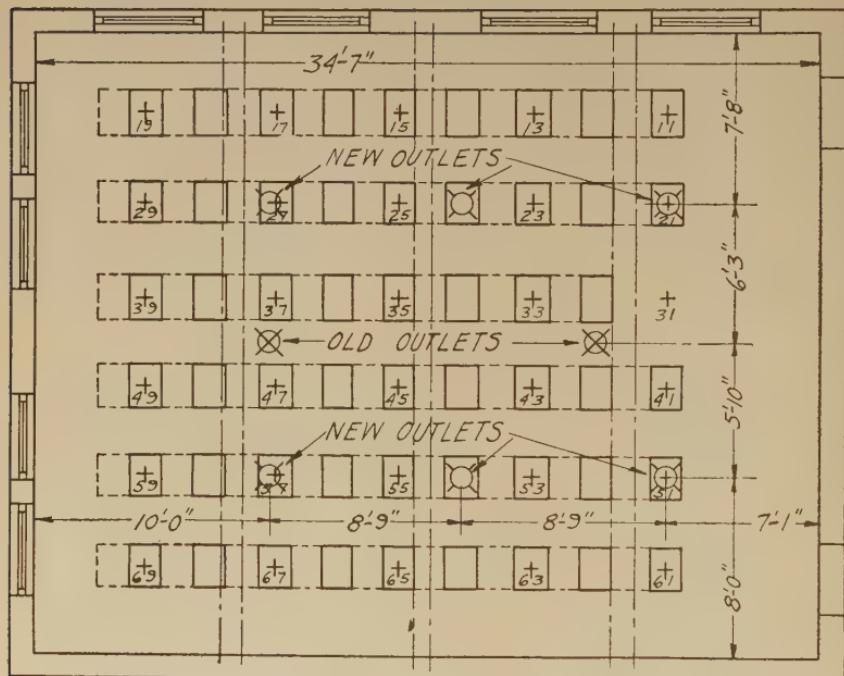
Plan of Schoolroom Showing Old and New Lighting Outlets
